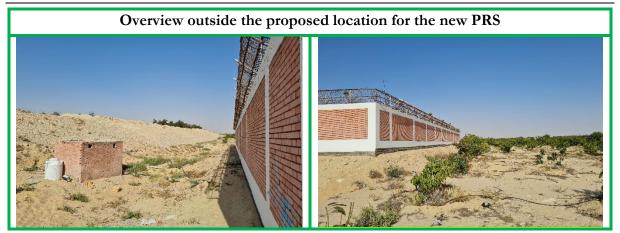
Shows Overview outside the proposed location for the new PRS
